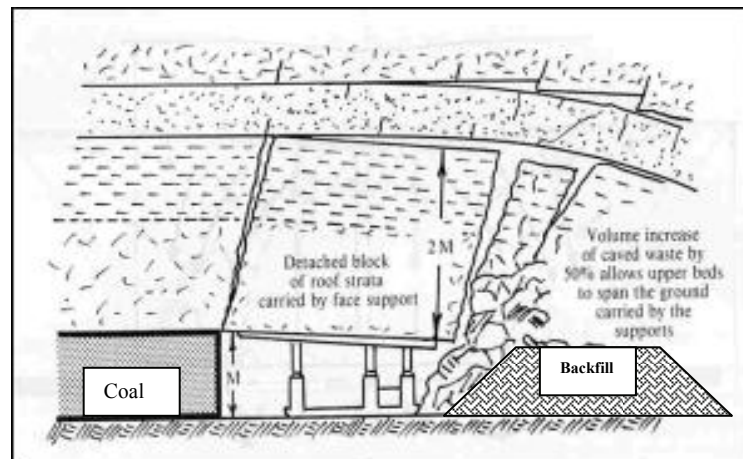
Typical mining methods: Longwall mining (Whittaker and Reddish, 1989)
